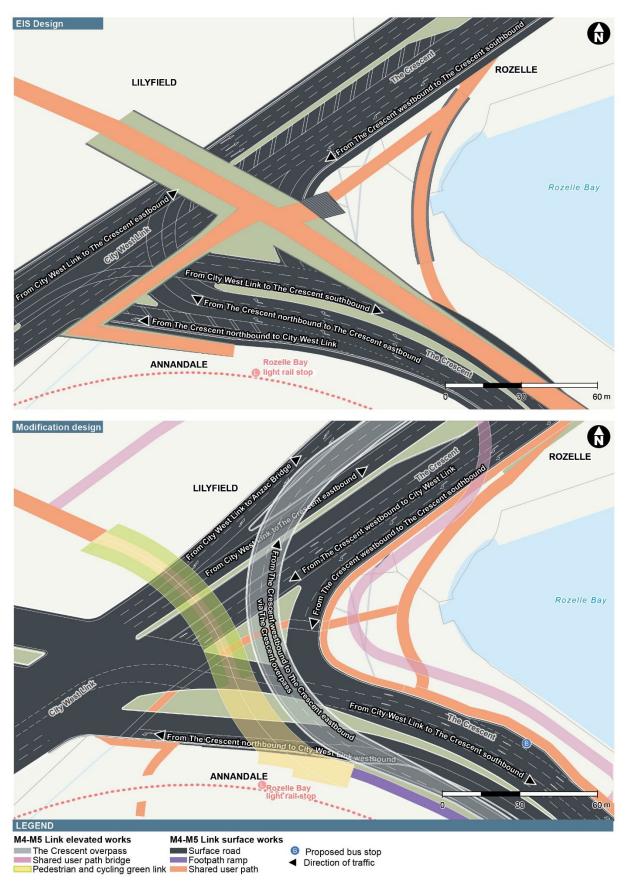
City West Link/The Crescent layout in EIS and proposed modification model
